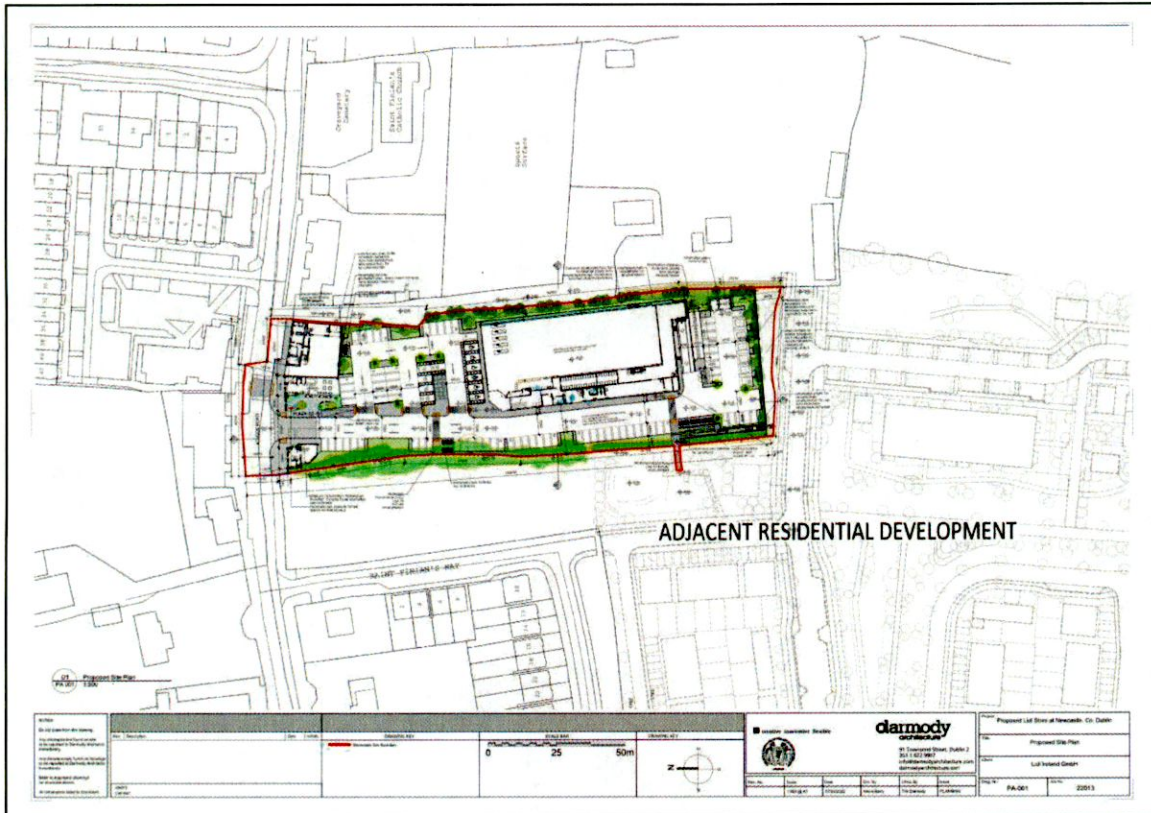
Site Plan for Lidl Newcastle, Co. Dublin [Source: Darmodity Architects] (Not to Scale)
